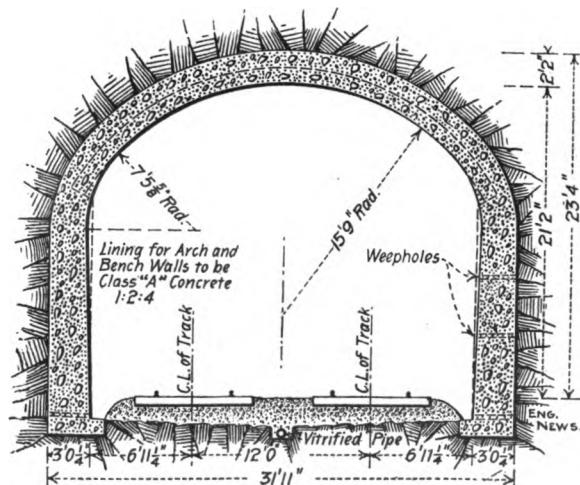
Section of Peekskill Tunnel, Showing Concrete Lining.
